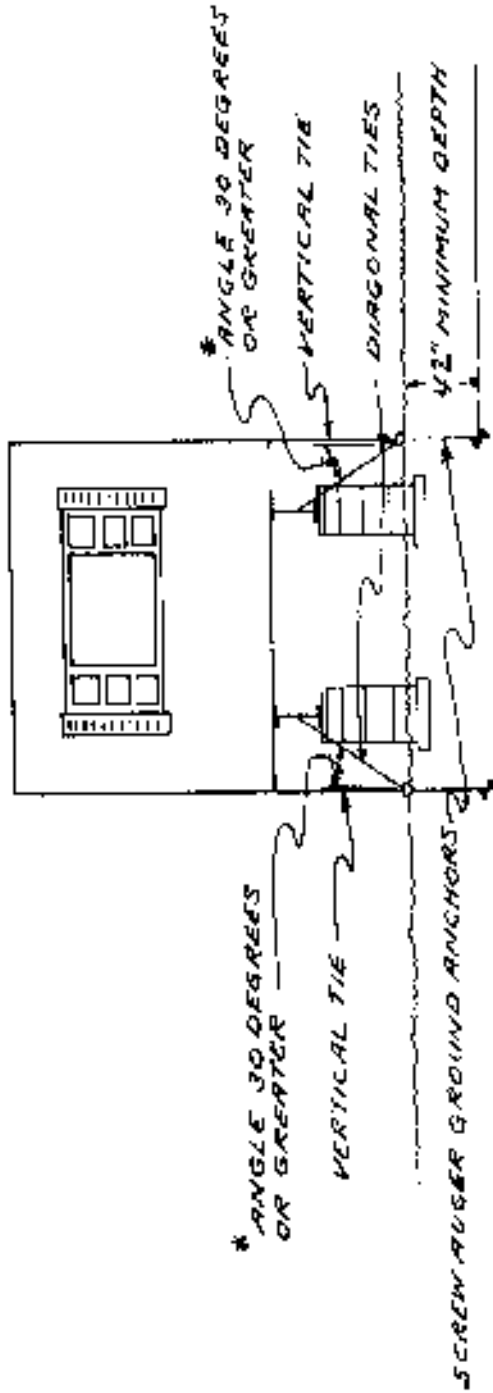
PIERS OVER 80" IN HEIGHT (DOUBLE BLOCK CONSTRUCTION, STEEL REINFORCED)
